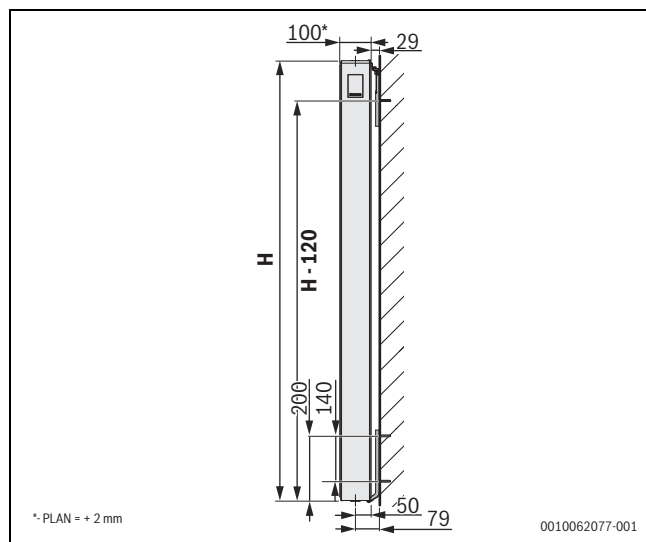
Installing radiators types 22 for CV Profil/ Plan.2
